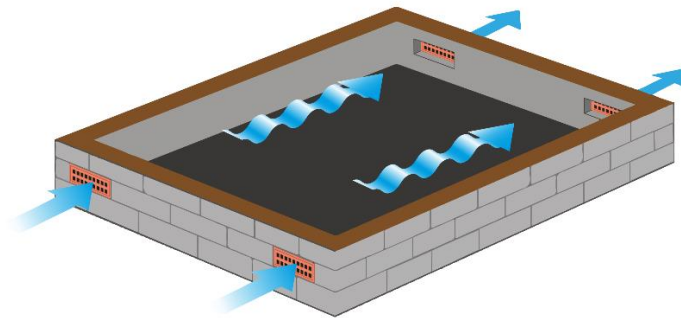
Crossflow Ventilation Created by Ventilation Openings on Opposing Walls
